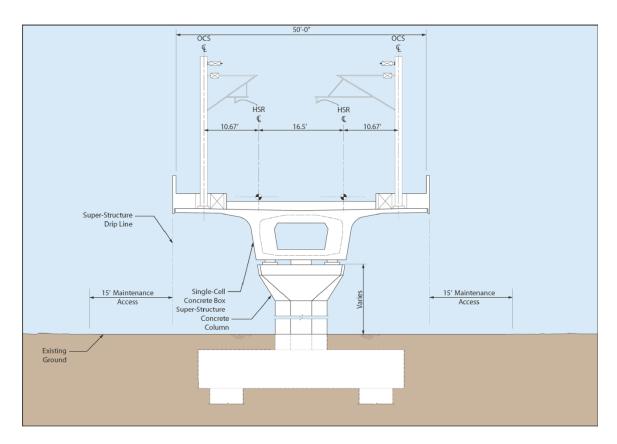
Typical High-Speed Rail Two-Track Elevated Cross Section
